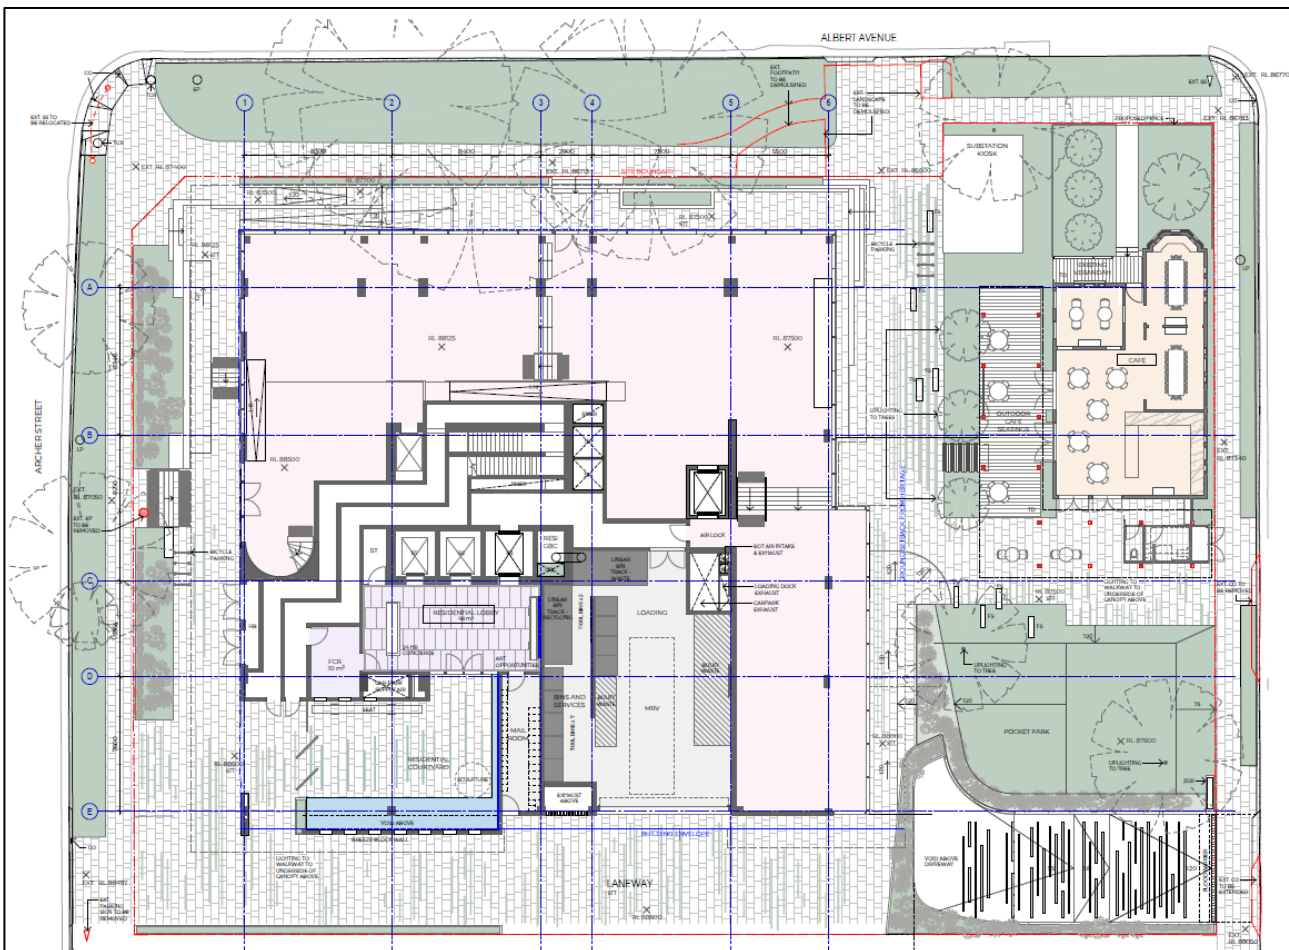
SITE LAYOUT PLAN – TO BE UPDATED UPON RECEIPT OF FINAL PLANS
